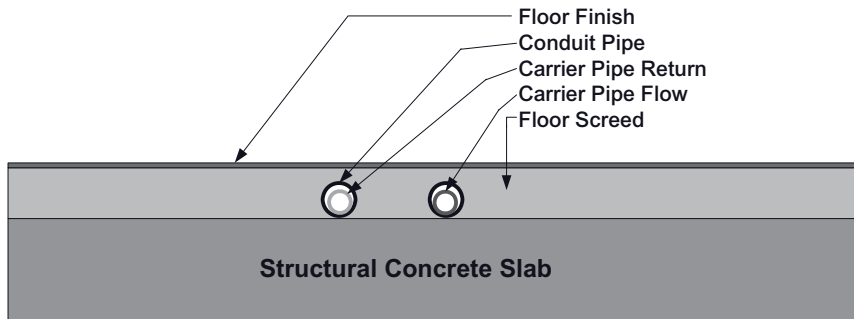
Section through solid floor construction showing heating flow and return installed within conduit pipes
